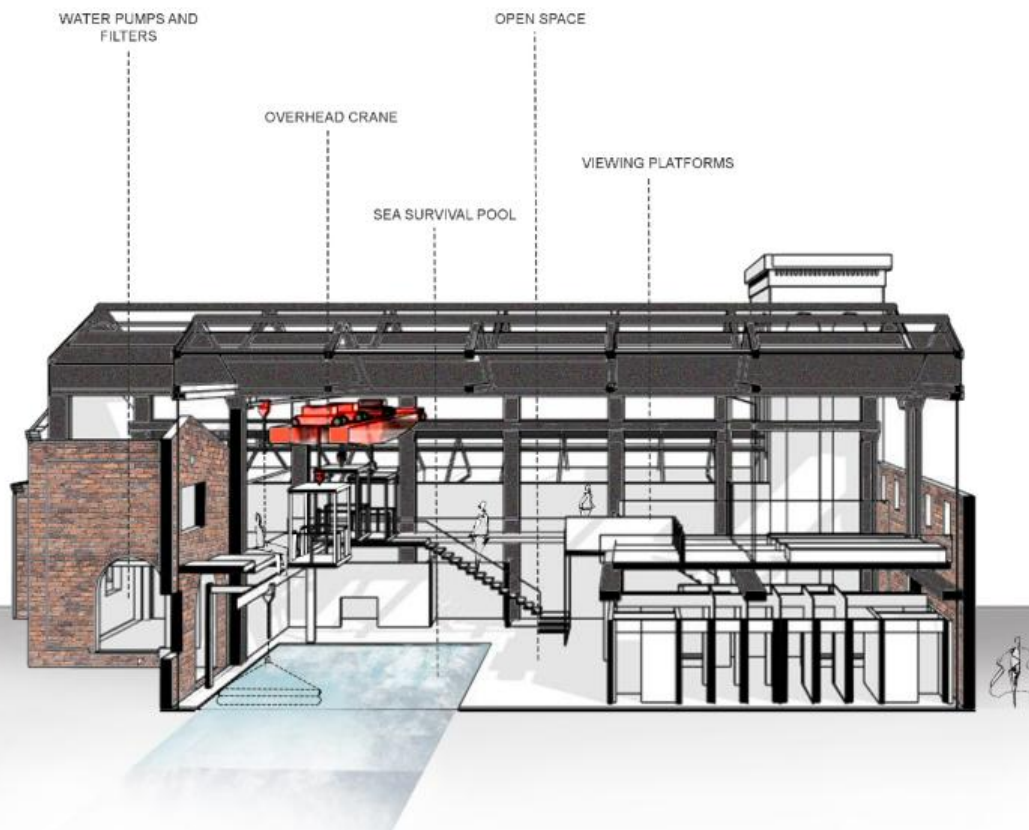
PROPOSED USE SHOWN ON LONG SECTION (RABIJ, 2021)
